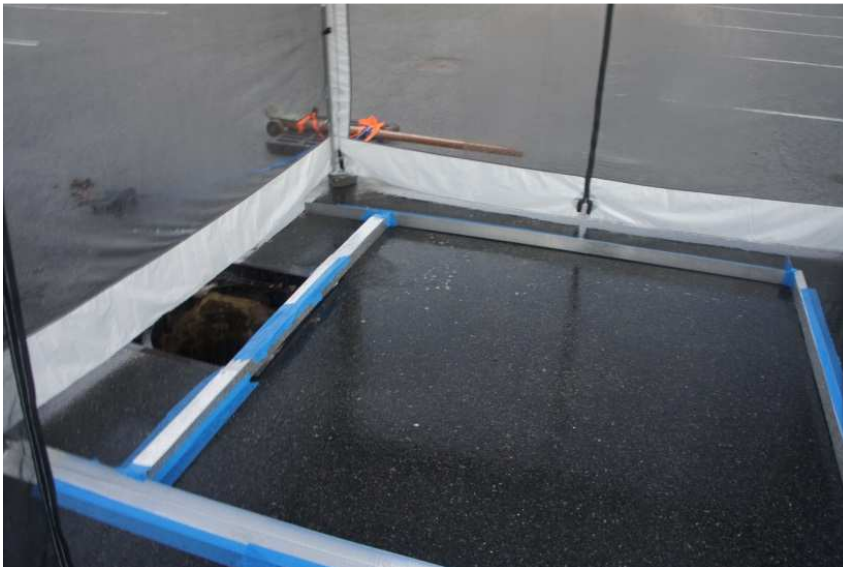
Parking lot study site, showing aluminum flashing and collection point
